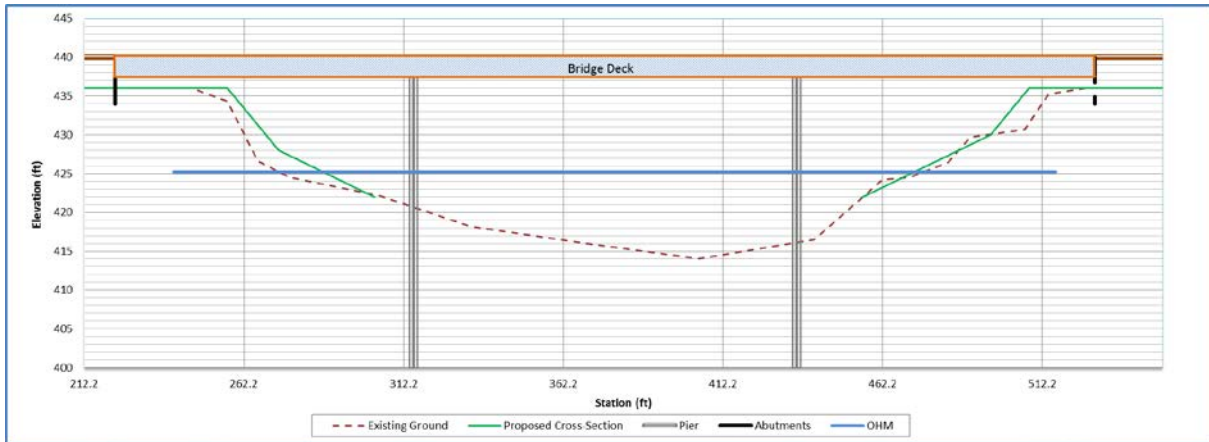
HEC-RAS upstream internal bridge cross section with existing ground and OHW
